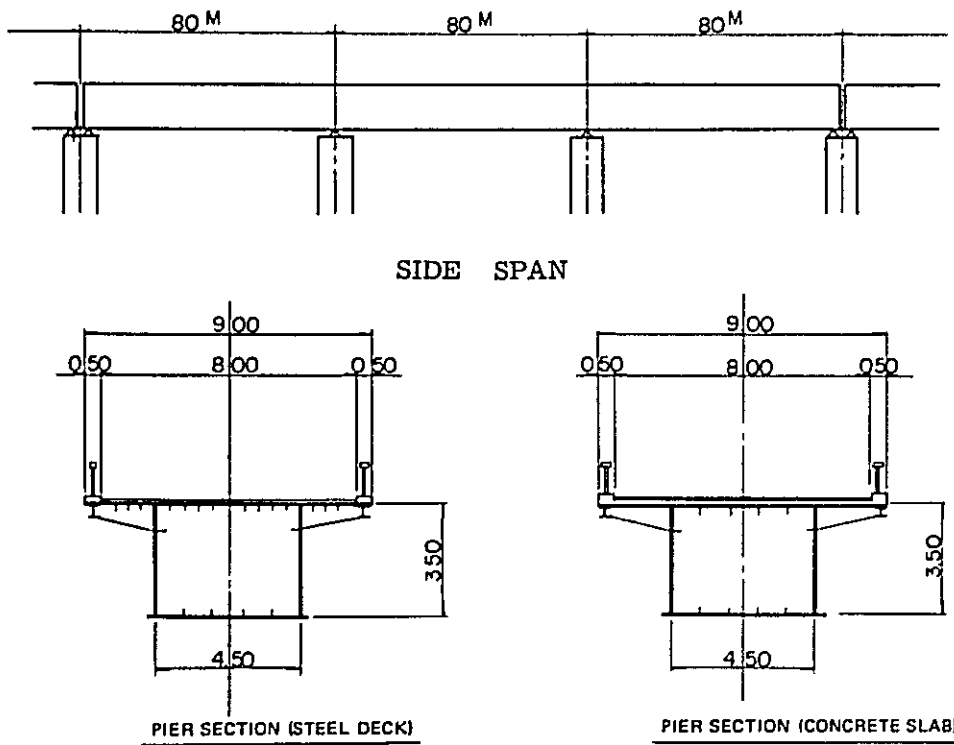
(2) SECTION OF 3-SPAN CONTINUOUS STEEL DECK BOX GIRDER
